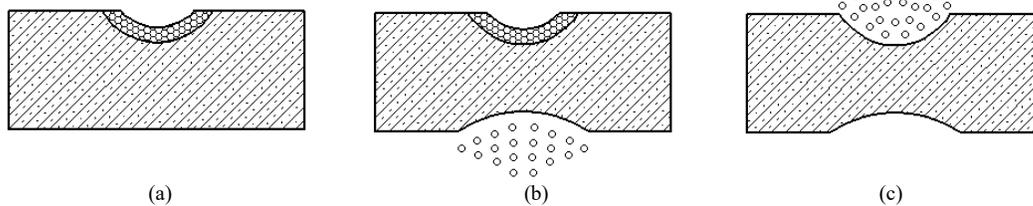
Impact process of a blast wave on the non-sprayed wall (a) Front surface of the wall is crushed after the compressional wave. (b) Back surface of the wall generates spallation after the expansion wave. (c) The crushed wall is thrown outward after the reflected wave.
